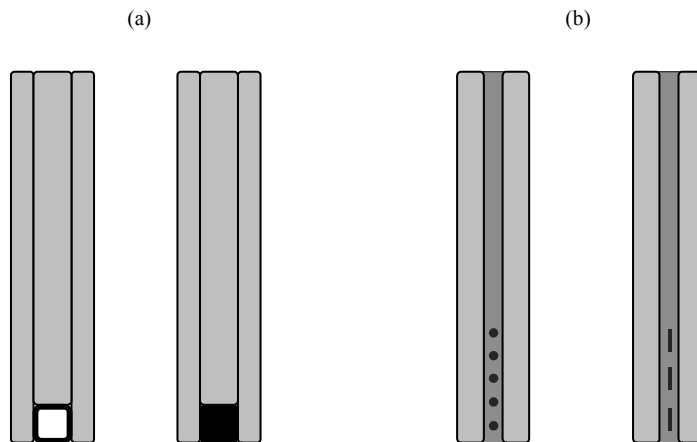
(a) Cross-section of triple-layer annealed float glass beams with a stainless steel reinforcement section bonded at the inner recessed edge; (b) Cross-section of double-layer annealed float glass beams with GFRP reinforcement rods embedded in the interlayer.
